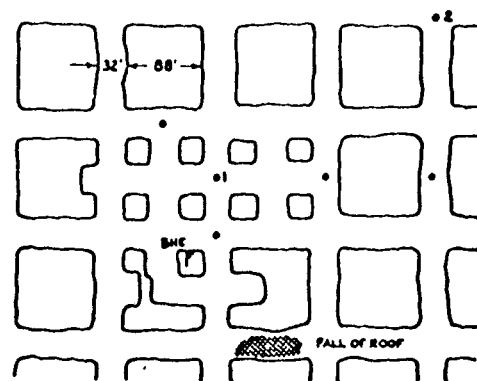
Layout of split pillars, showing convergence points and borehole extensometer (BHE)
